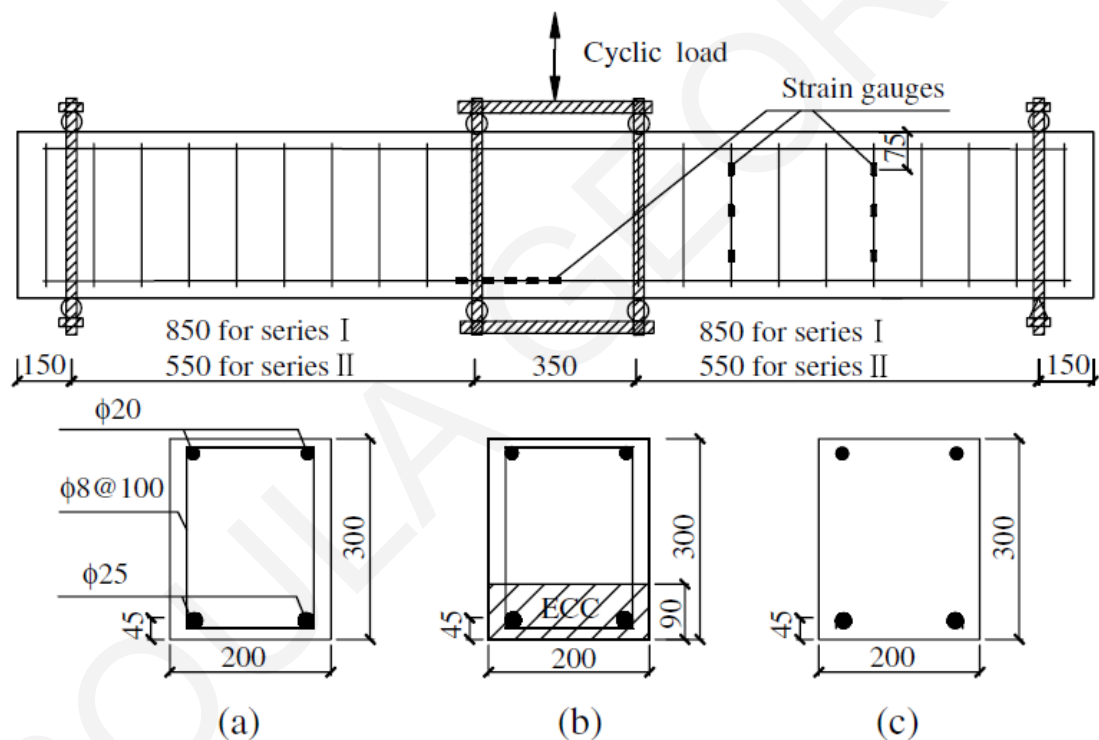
Schematic illustration of test setup and specimen details [164]
